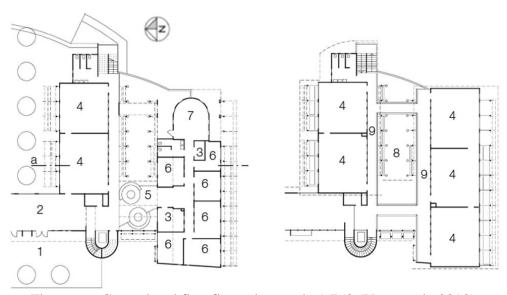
Ground and first floor plan, scale 1:750 (Voss et al., 2013)
